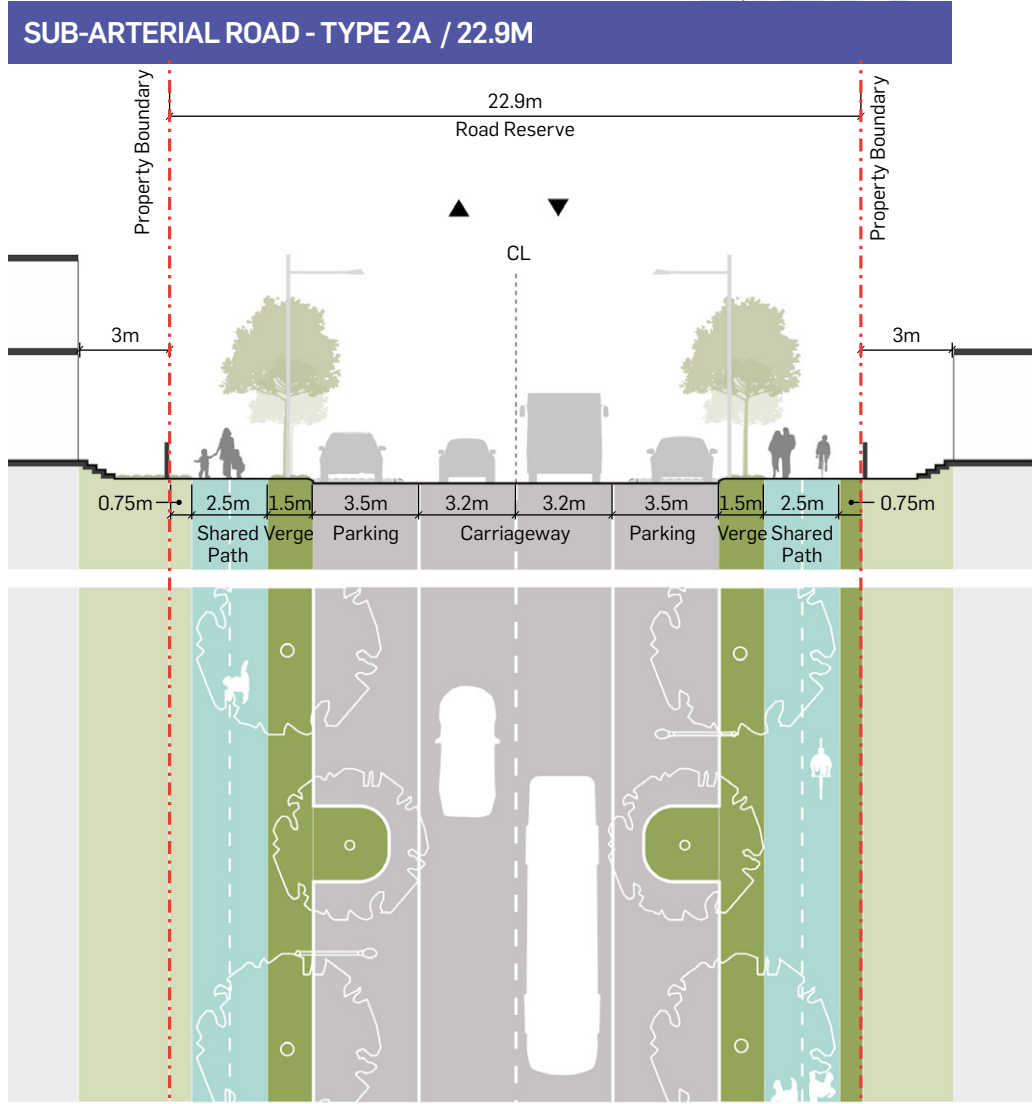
Indicative Street Section B-B' - Sub-Arterial Road - Type 2A
